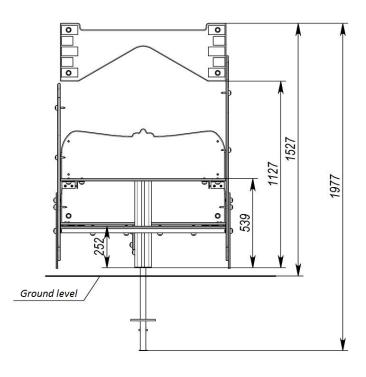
Between towers 0,7-2m (beams 3,5m) and central tower 1,9x1,9m (beams 3,5m) place tunnel crossing:
